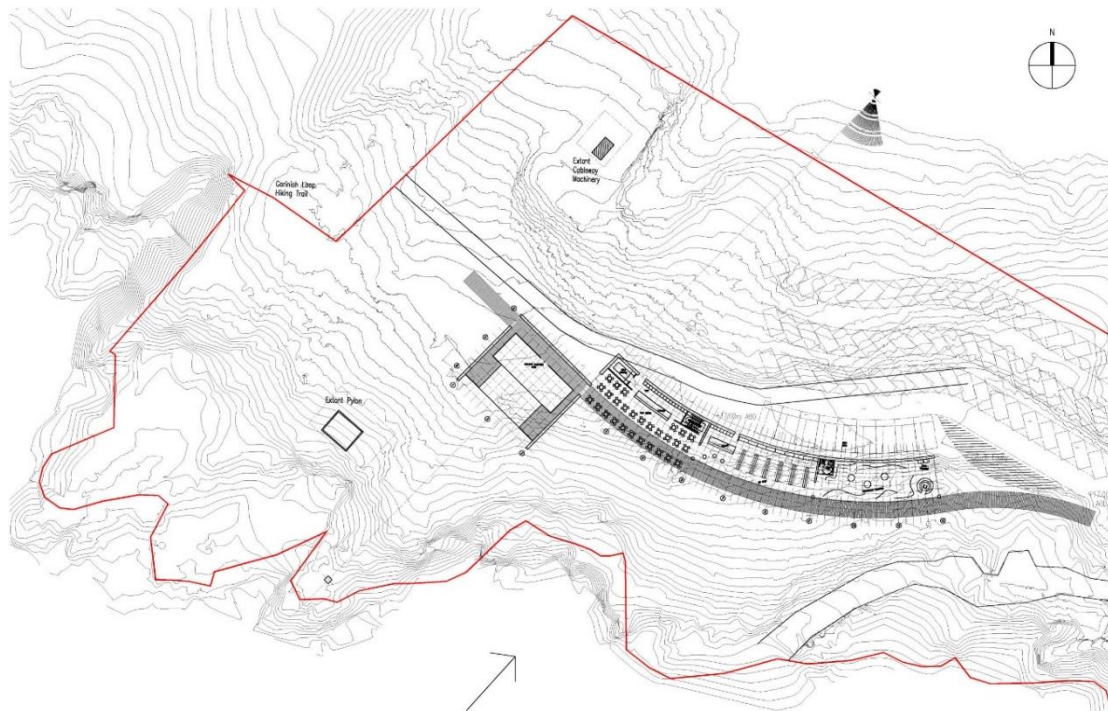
Option 3c architectural site plan showing the line station platforms moved forward towards the water
